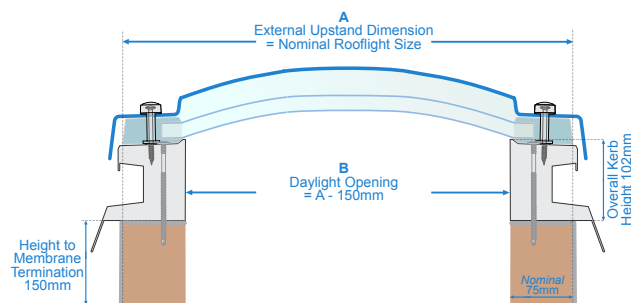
opening / ventilated dome without sloped or 300mm kerb
